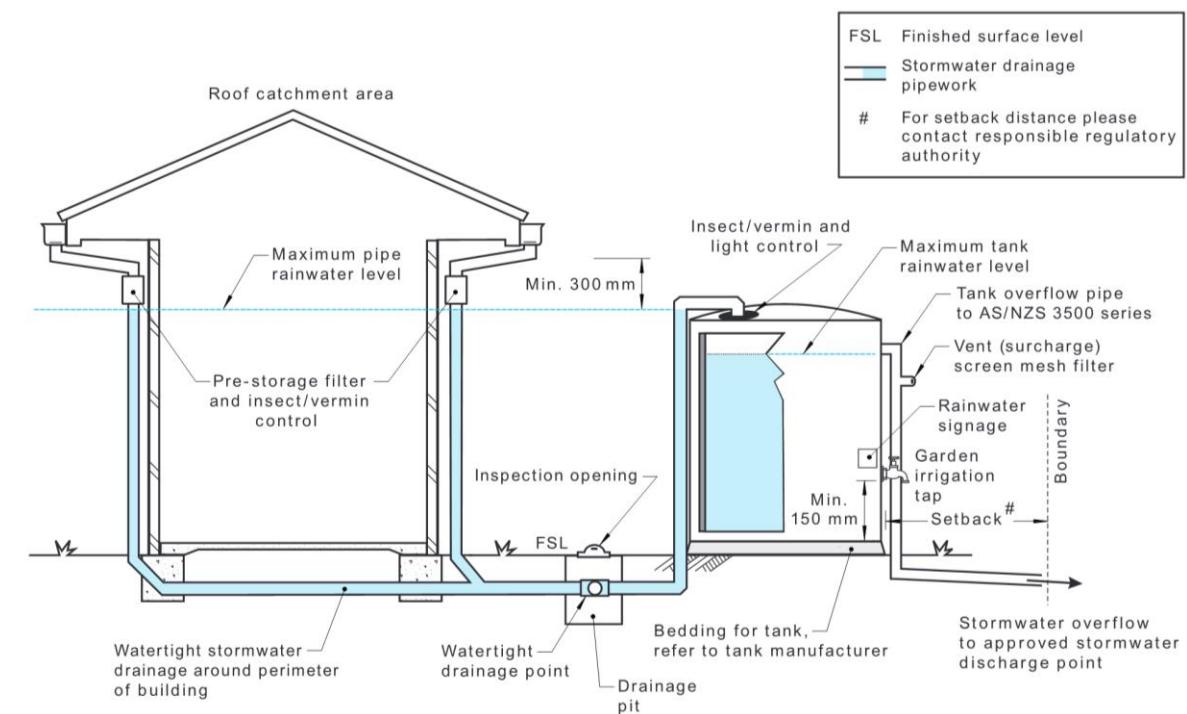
Charged (wet) above ground installation (source: Australian Standards 2008)
